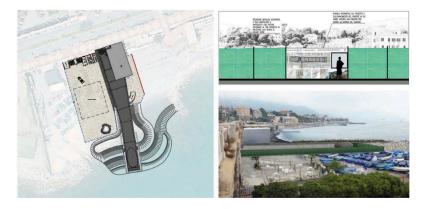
Bisagno diversion tunnel: downstream section. Plan and area overview.
